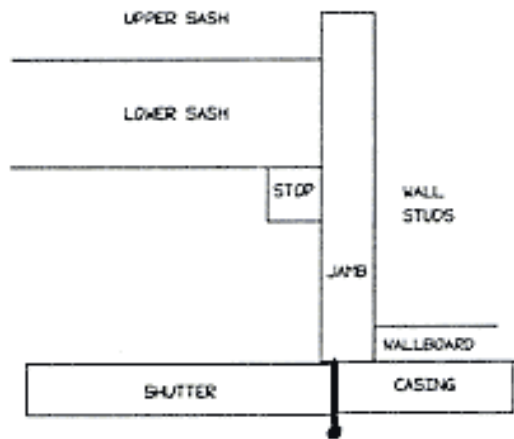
INSIDE MOUNT; SHUTTERS MOUNTED TO SQUARE-EDGE CASING; WILL FOLD BACK FLAT
